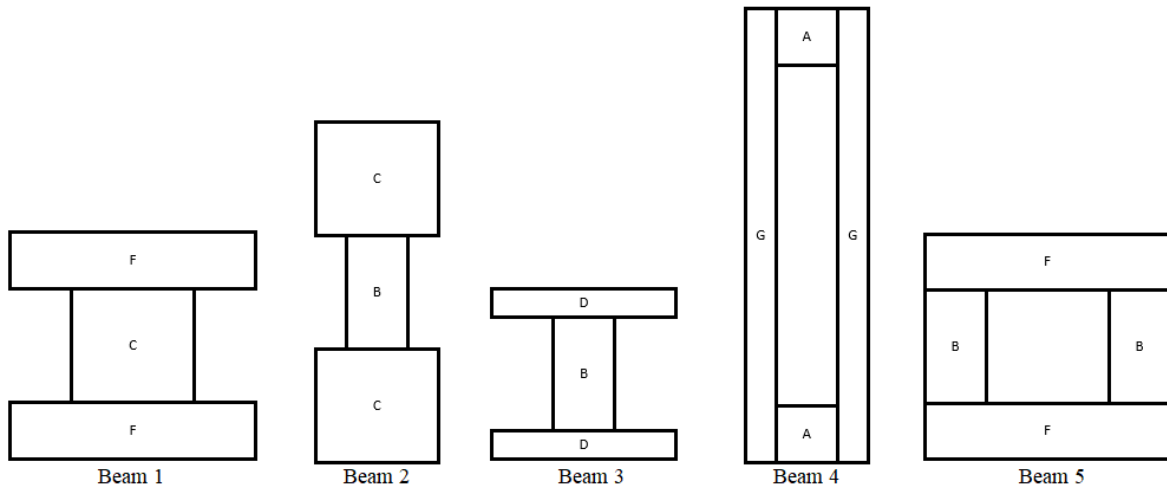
Mini basswood beams constructed during Class Meeting 1.
